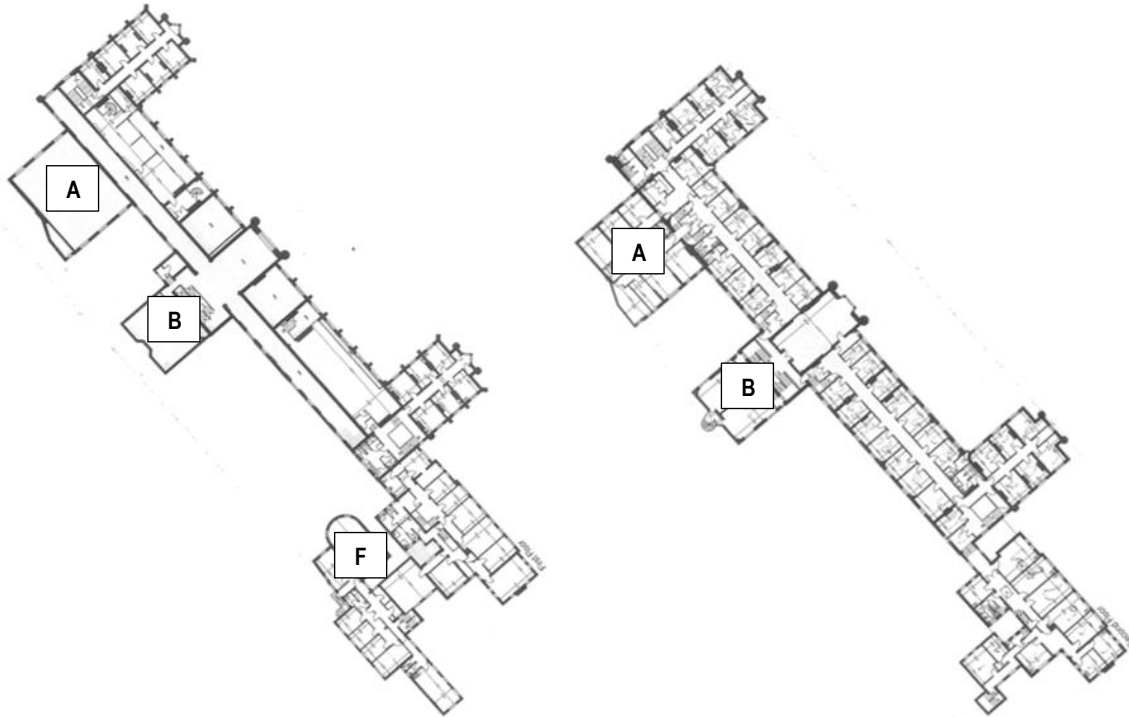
(left): Existing first/mezzanine floor. Note rear extensions labelled A, B & F.
